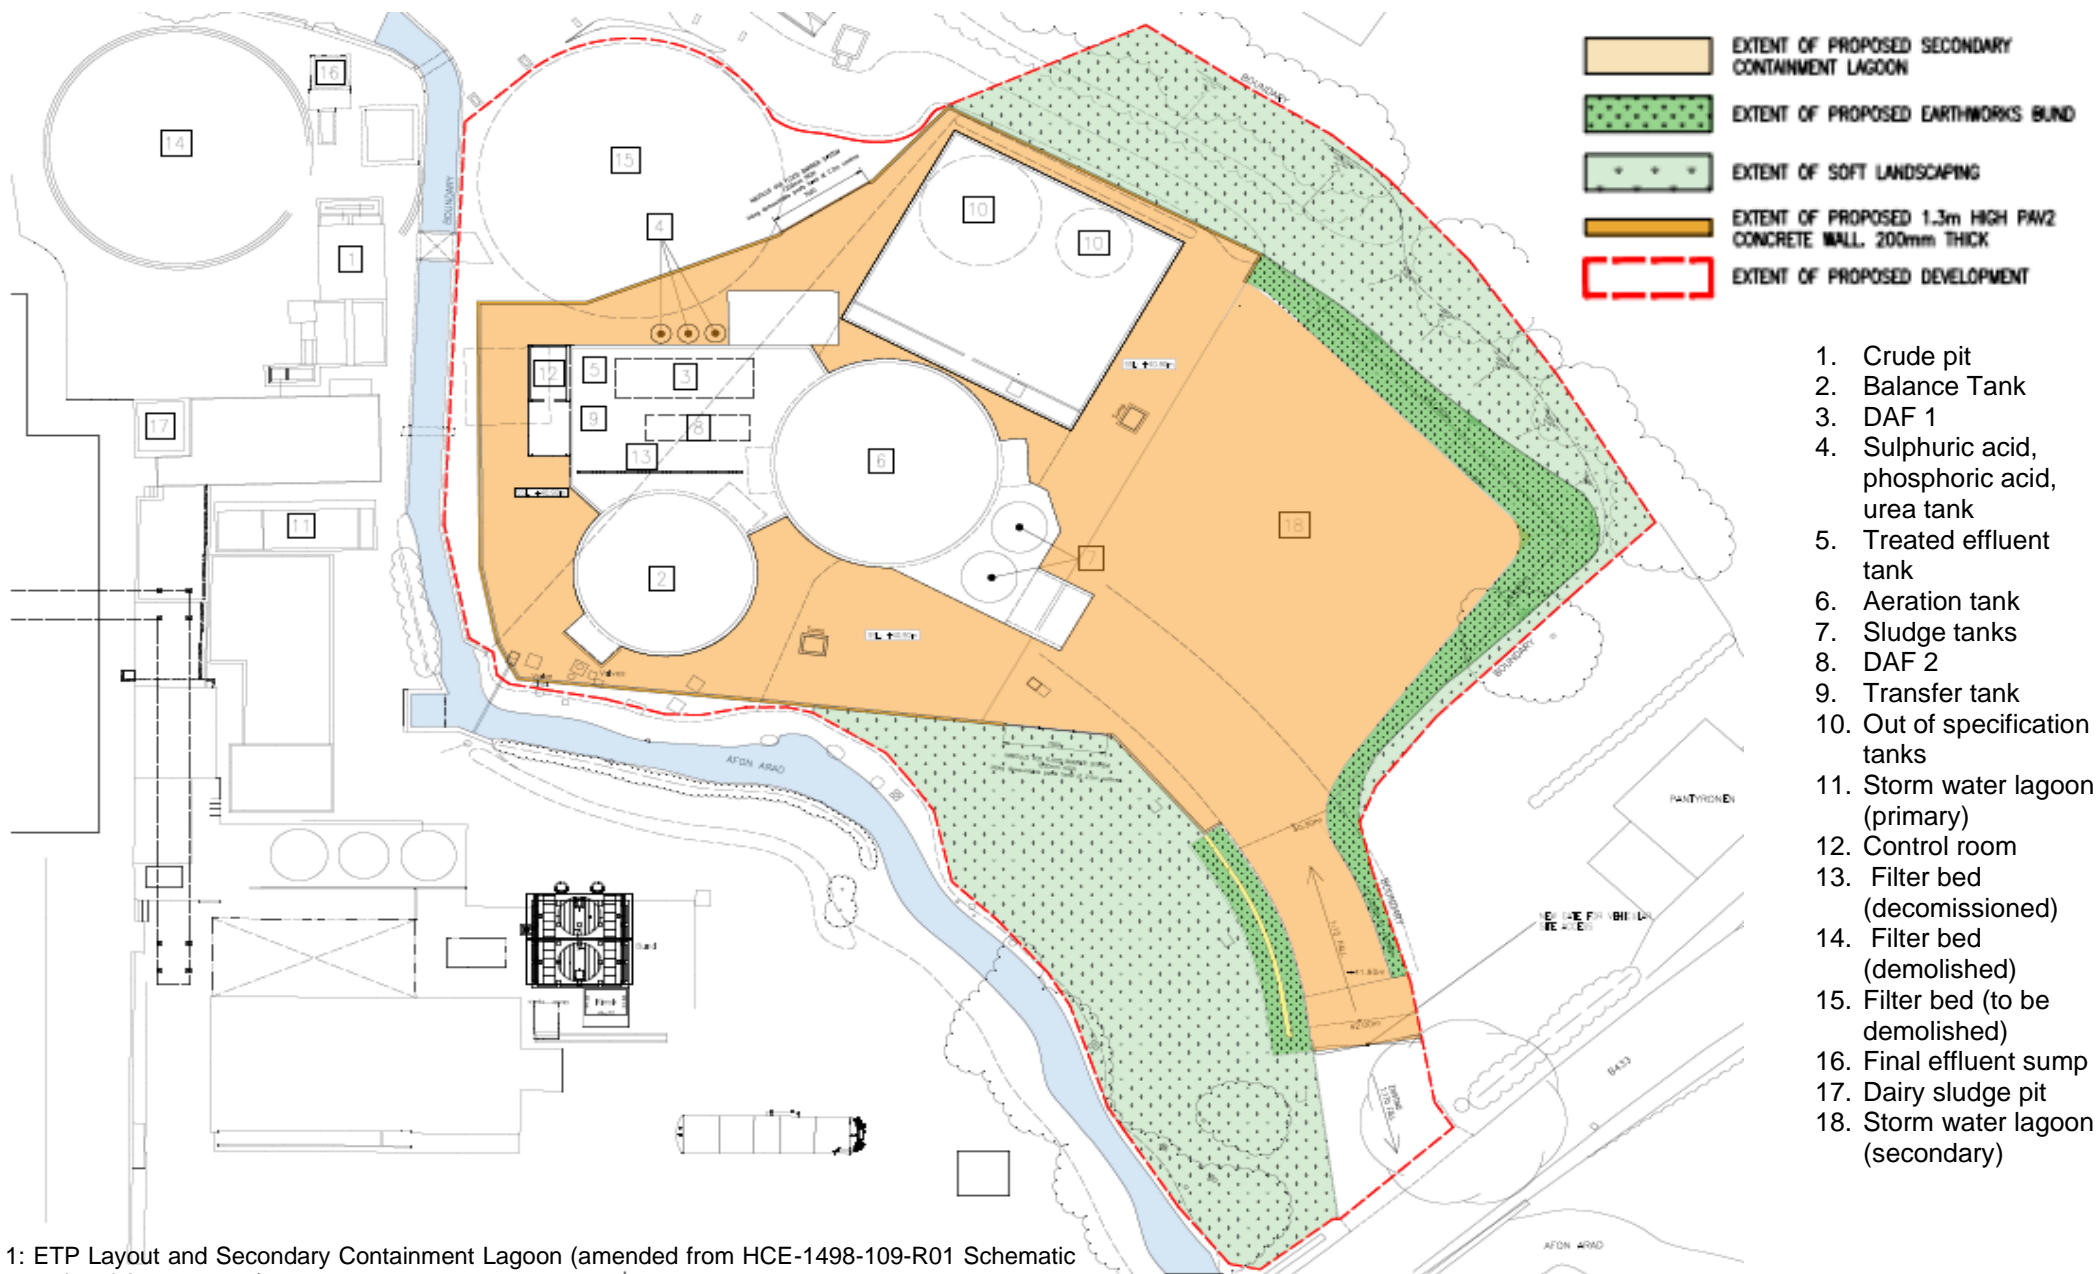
ETP Layout and Secondary Containment Lagoon (amended from HCE-1498-109-R01 Schematic Site Layout dated August 2022)
